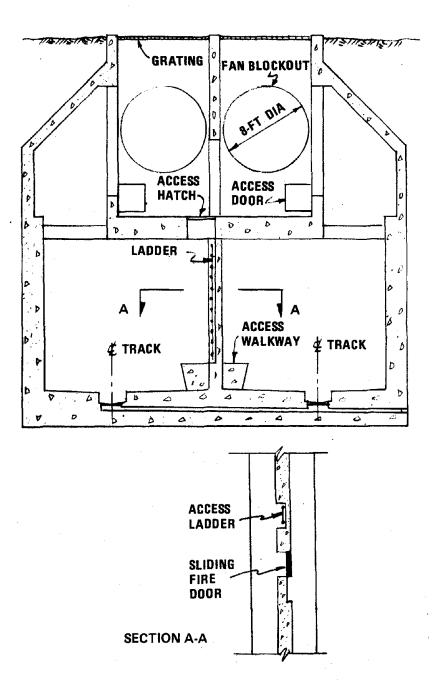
VENTILATION STRUCTURE TERMINATION AND ACCESS – TWIN CELL
